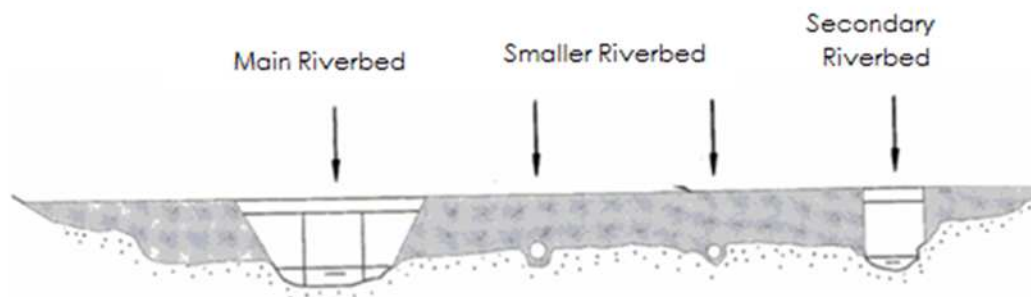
Cross section of spans of relief (Martin Vide, 2003).
